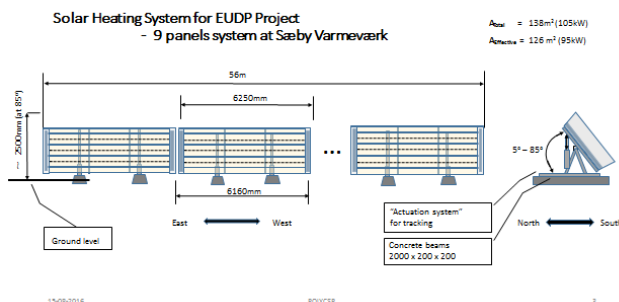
Principal drawing of the POLYCSP collectors mounted in a collector row with low accuracy tracking.
